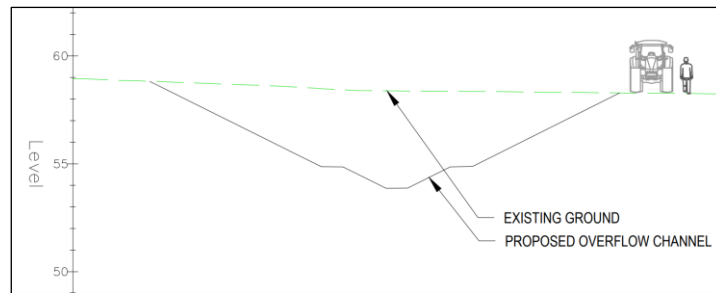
Concept Cross Section in deep cut section showing existing and proposed levels
